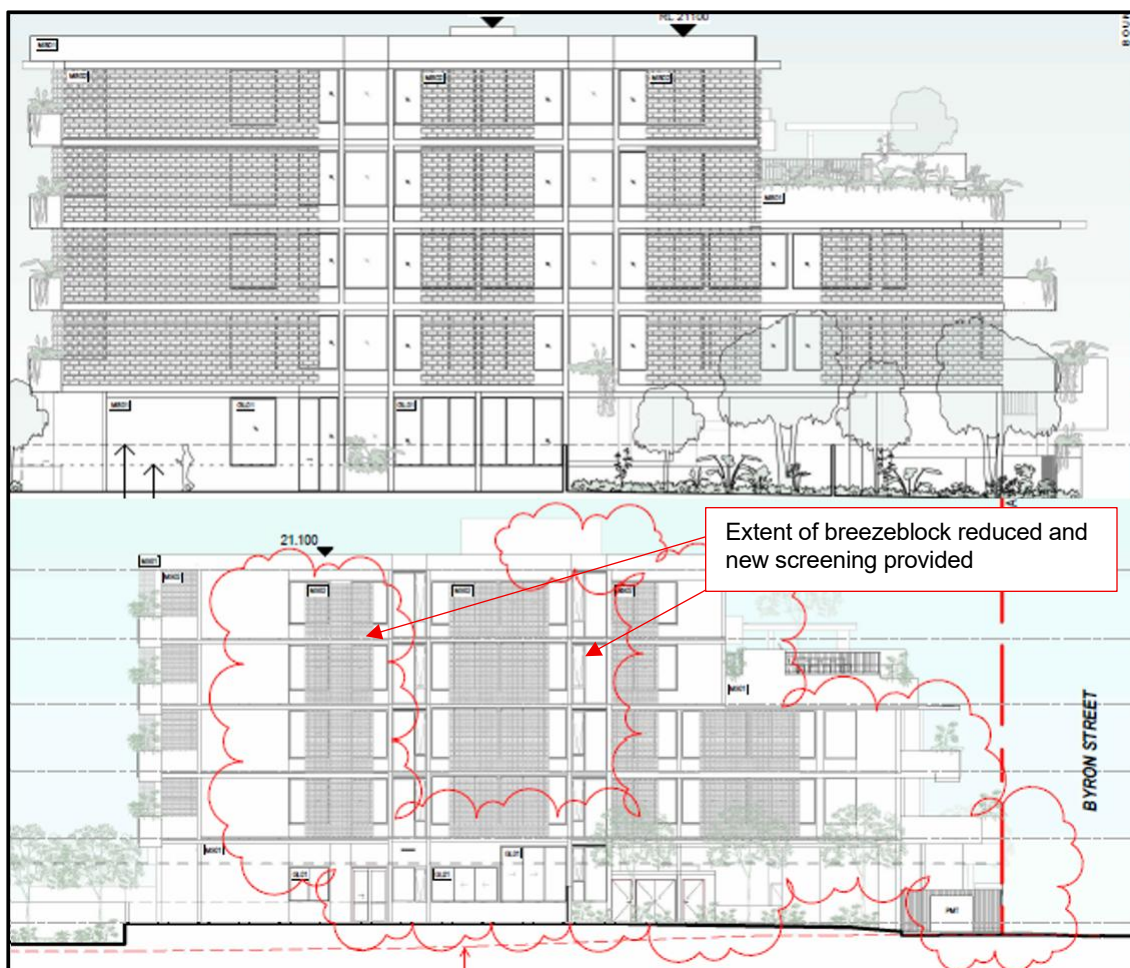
Approved West Elevation (Top) vs Proposed West Elevation (Bottom) (Source: MODE)
